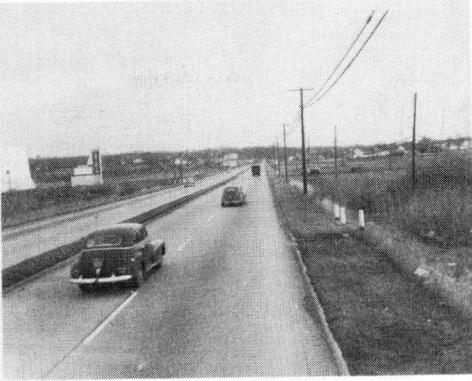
Towns of New Haven and East Haven, Route US 1, (Saltonstall Parkway)
